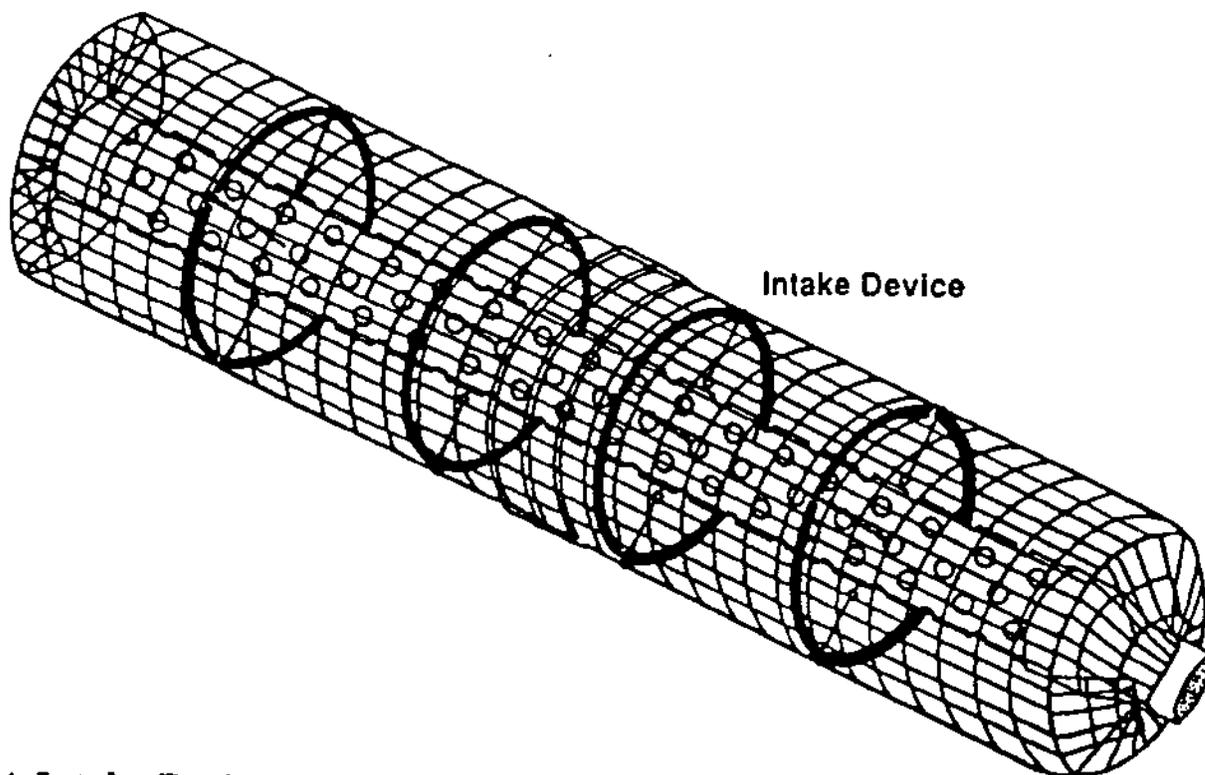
Beaver Pond Leveler in Combination with Fish Pond Standpipe-Culvert Water Control Structure
